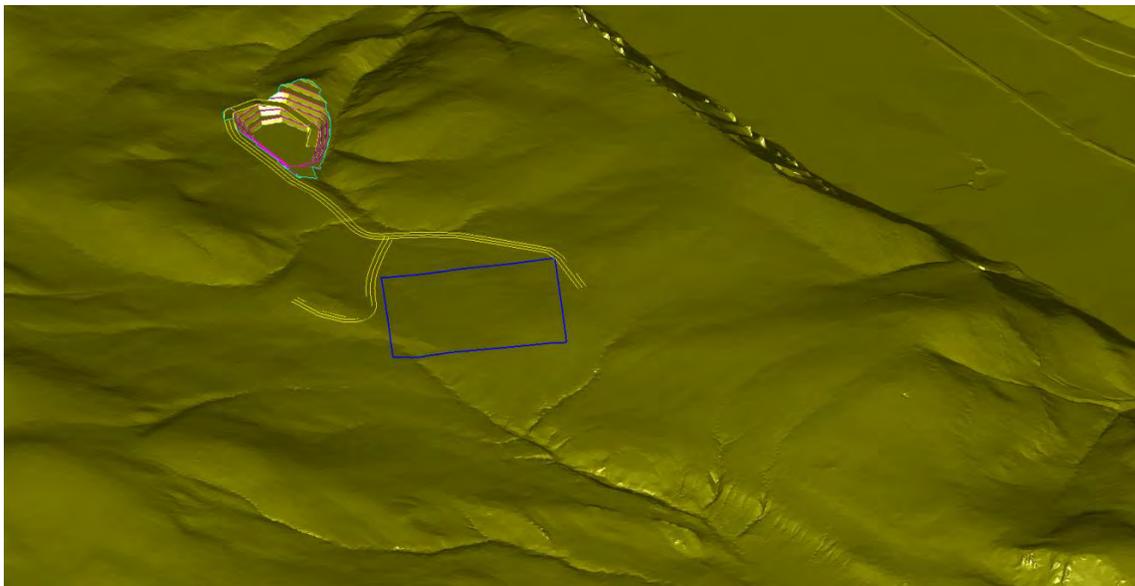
MLR Phase 1 with Plant Site (blue)
